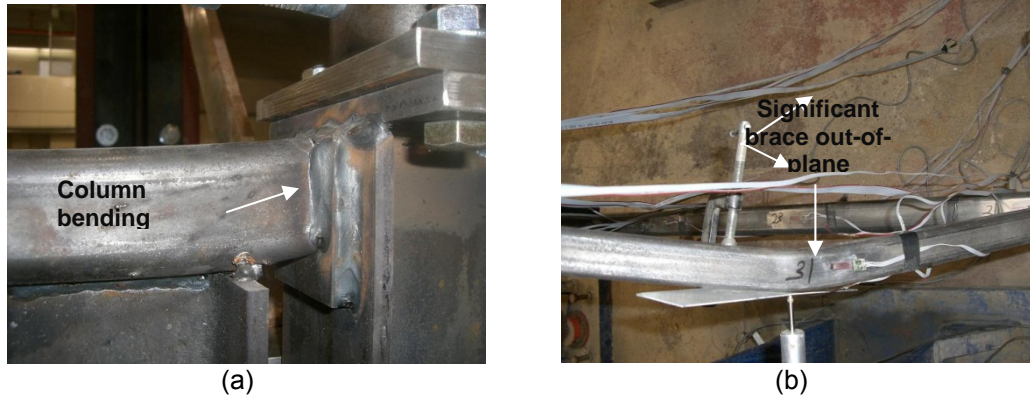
(a) Column Bending Deformation in MSB Braced Specimen (b) Brace Out-of-Plane Deformation in Regular Braced Specimen
